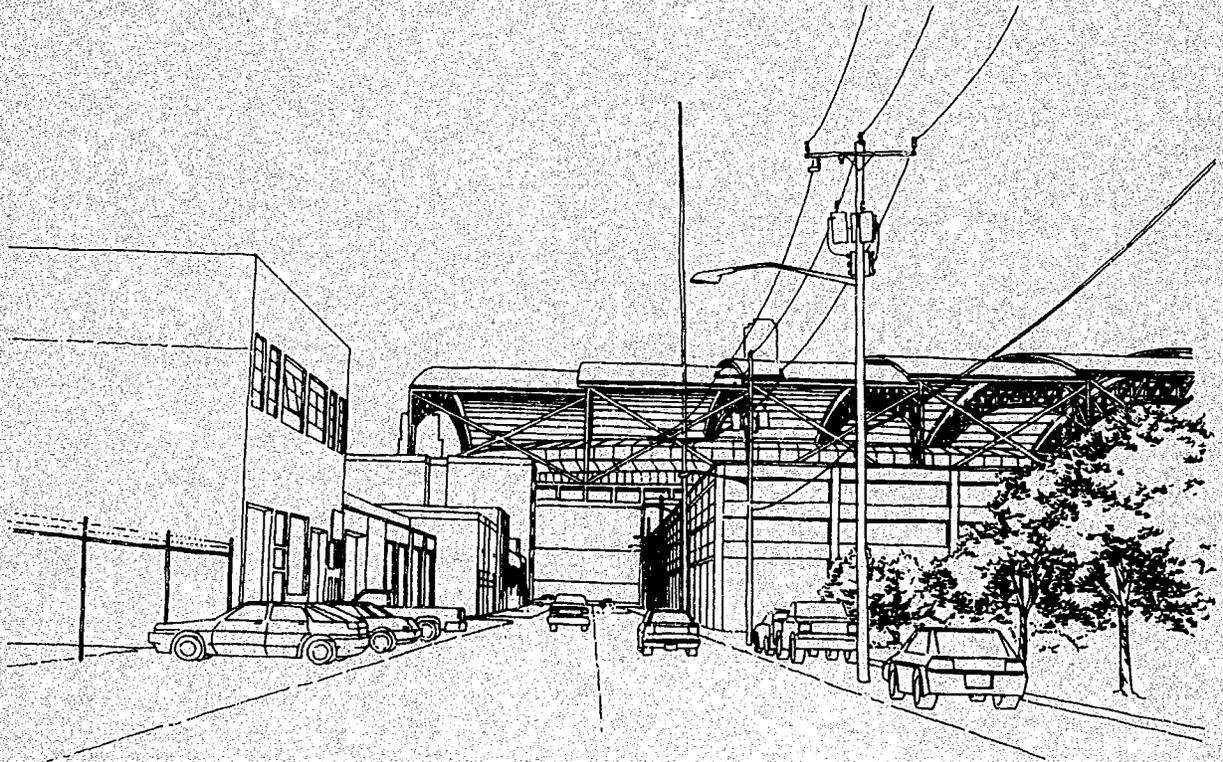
View 12. *Looking southwest from 4th Avenue South at approximately Airport Way, Ballpark at Site C, roof extended.
